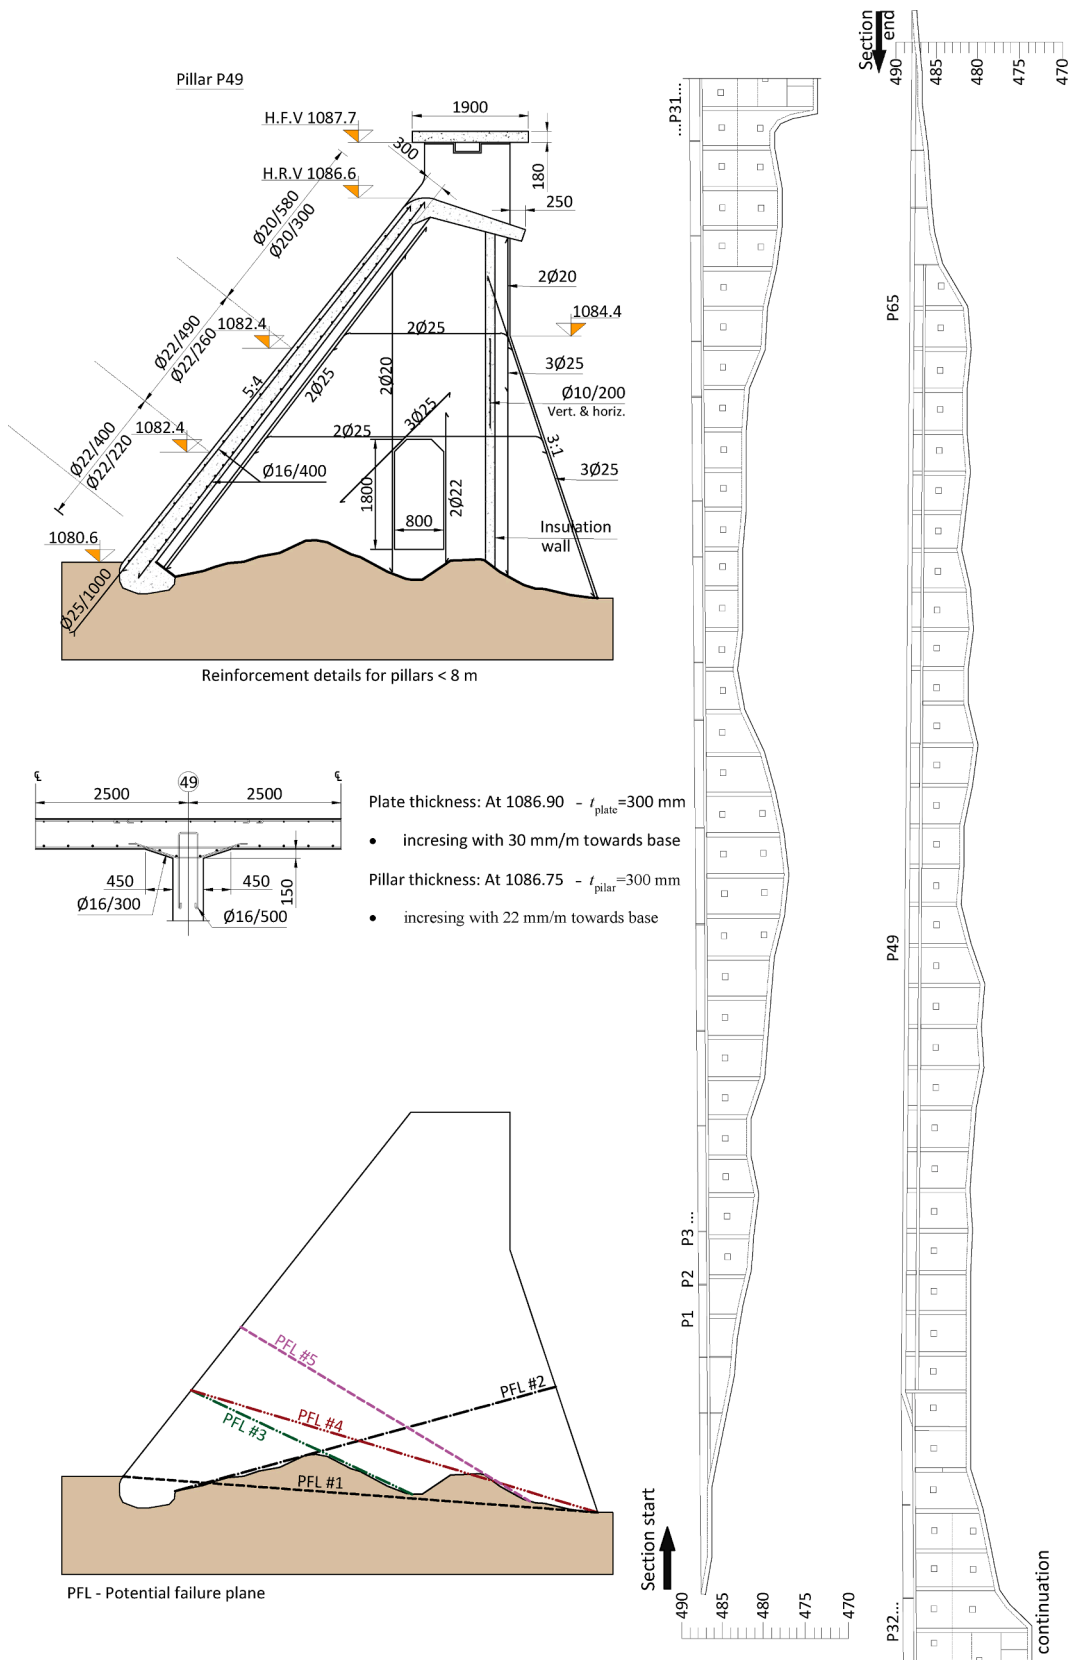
Overview of the dam, the reinforcement detailing and geometry of pillar 49, and potential assumed failure planes.
